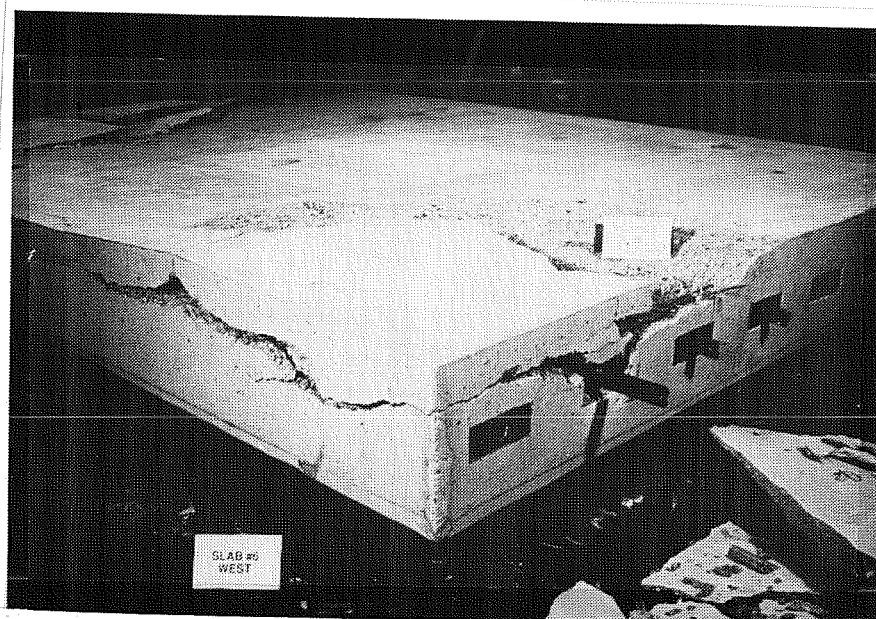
Vertical Splitting at Failed Anchor B in Slab #6
